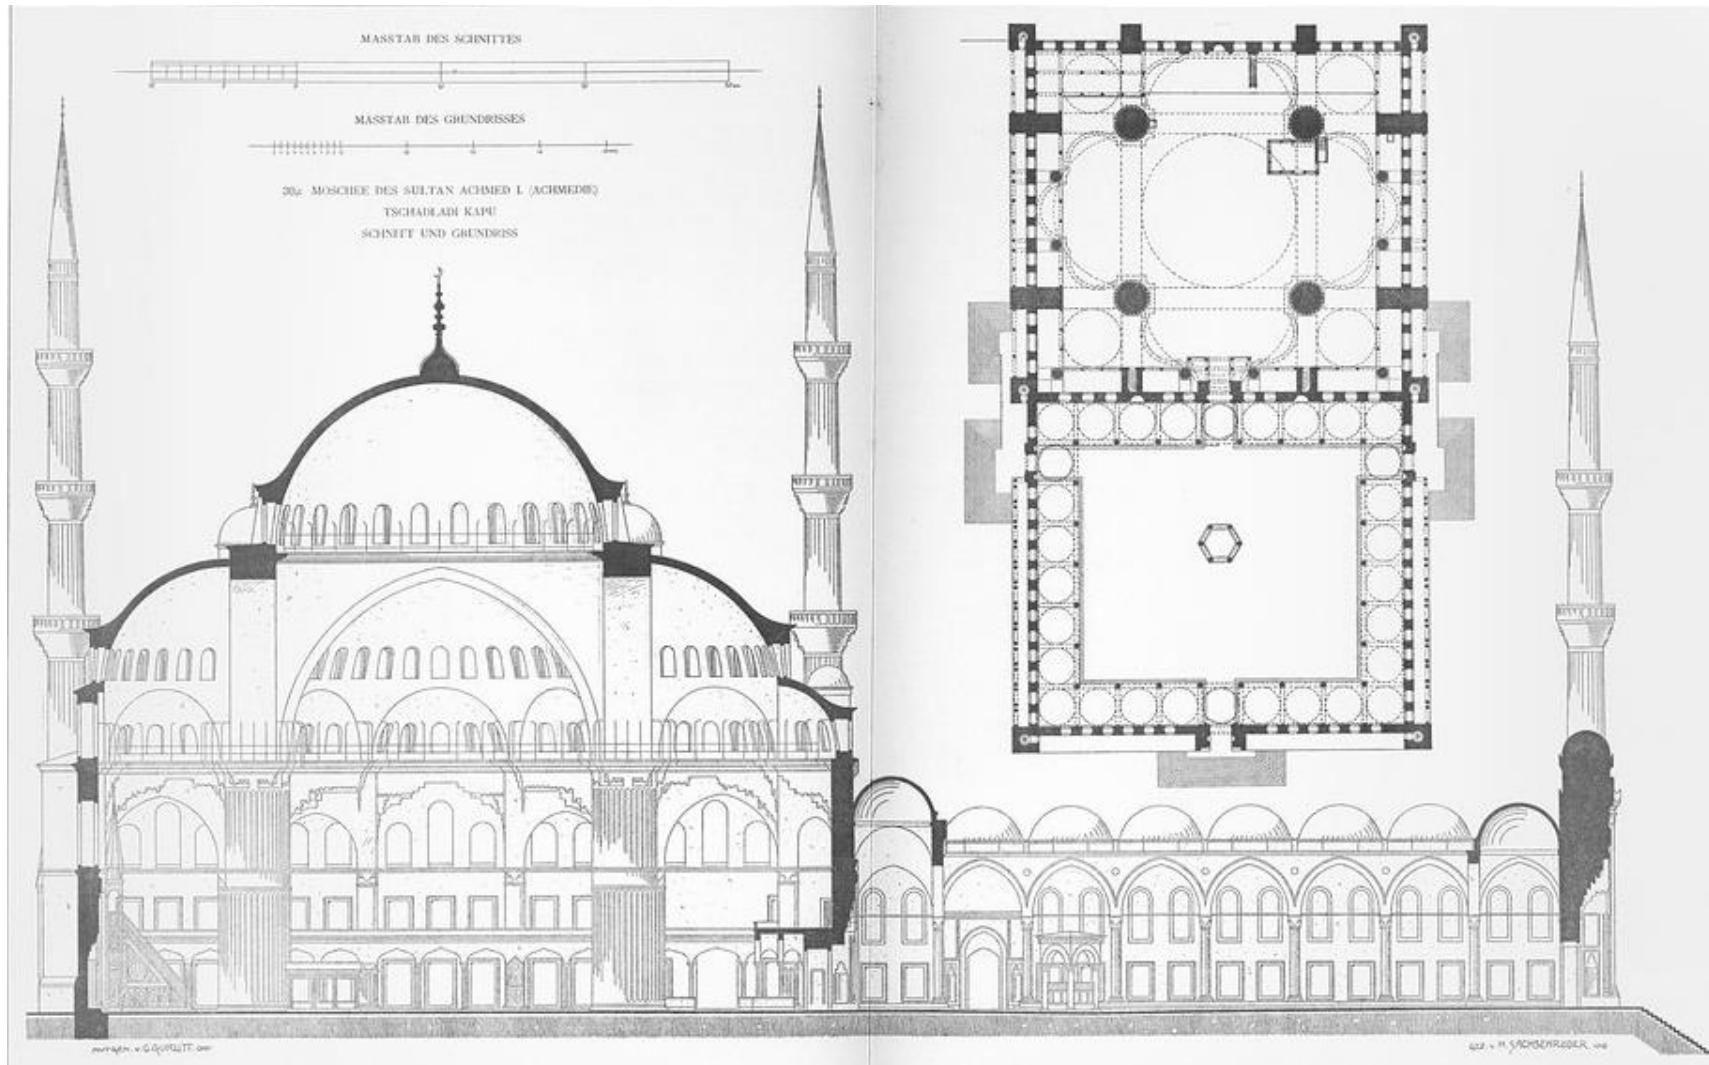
Blue Mosque longitudinal cross section and floor plan.
